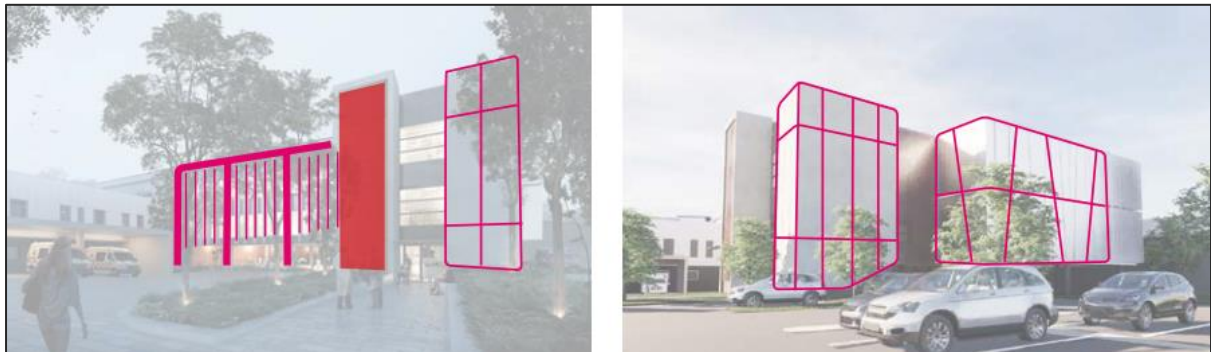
| Primary façade layer, northern elevation (left) and western elevation (right) (Source: Applicant's RtS 2021)
